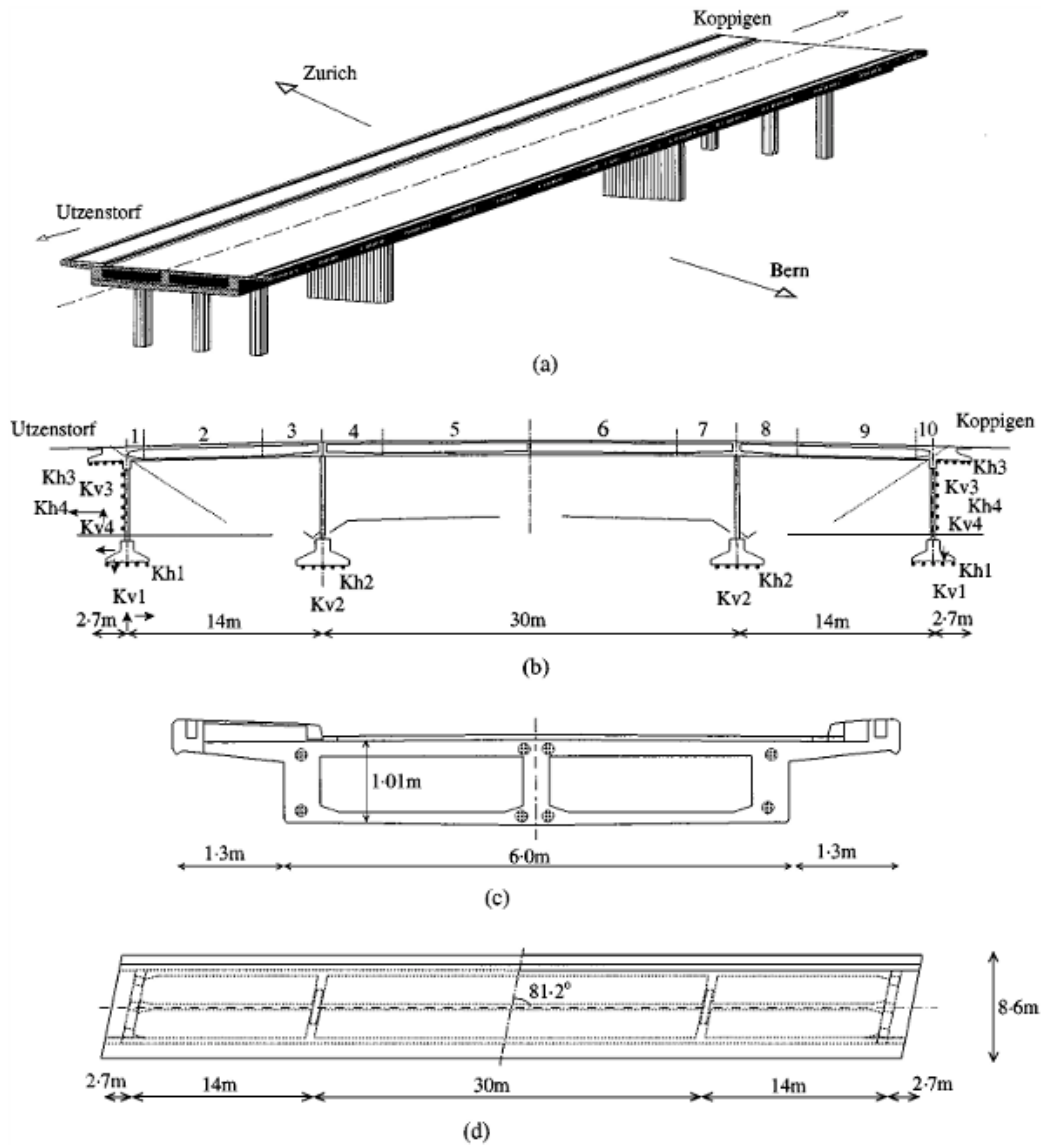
Sketch of bridge Z24. (a), Global view; (b), elevation; (c), cross-section; (d), plan.
